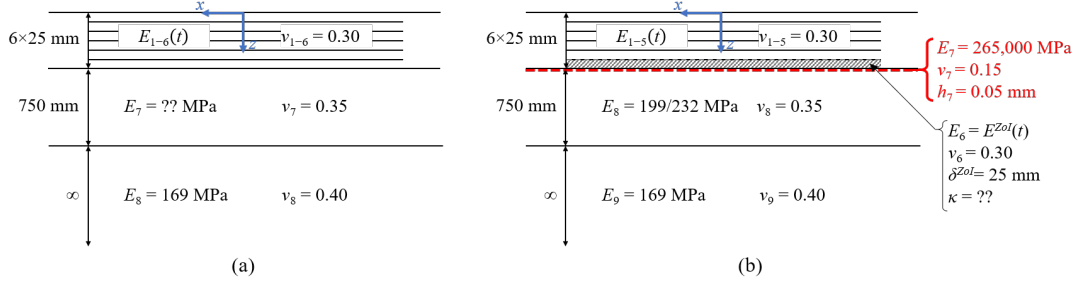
Pavement modelling as a layered VE system: (a) unreinforced S-0 section, and (b) reinforced S-1 section.
